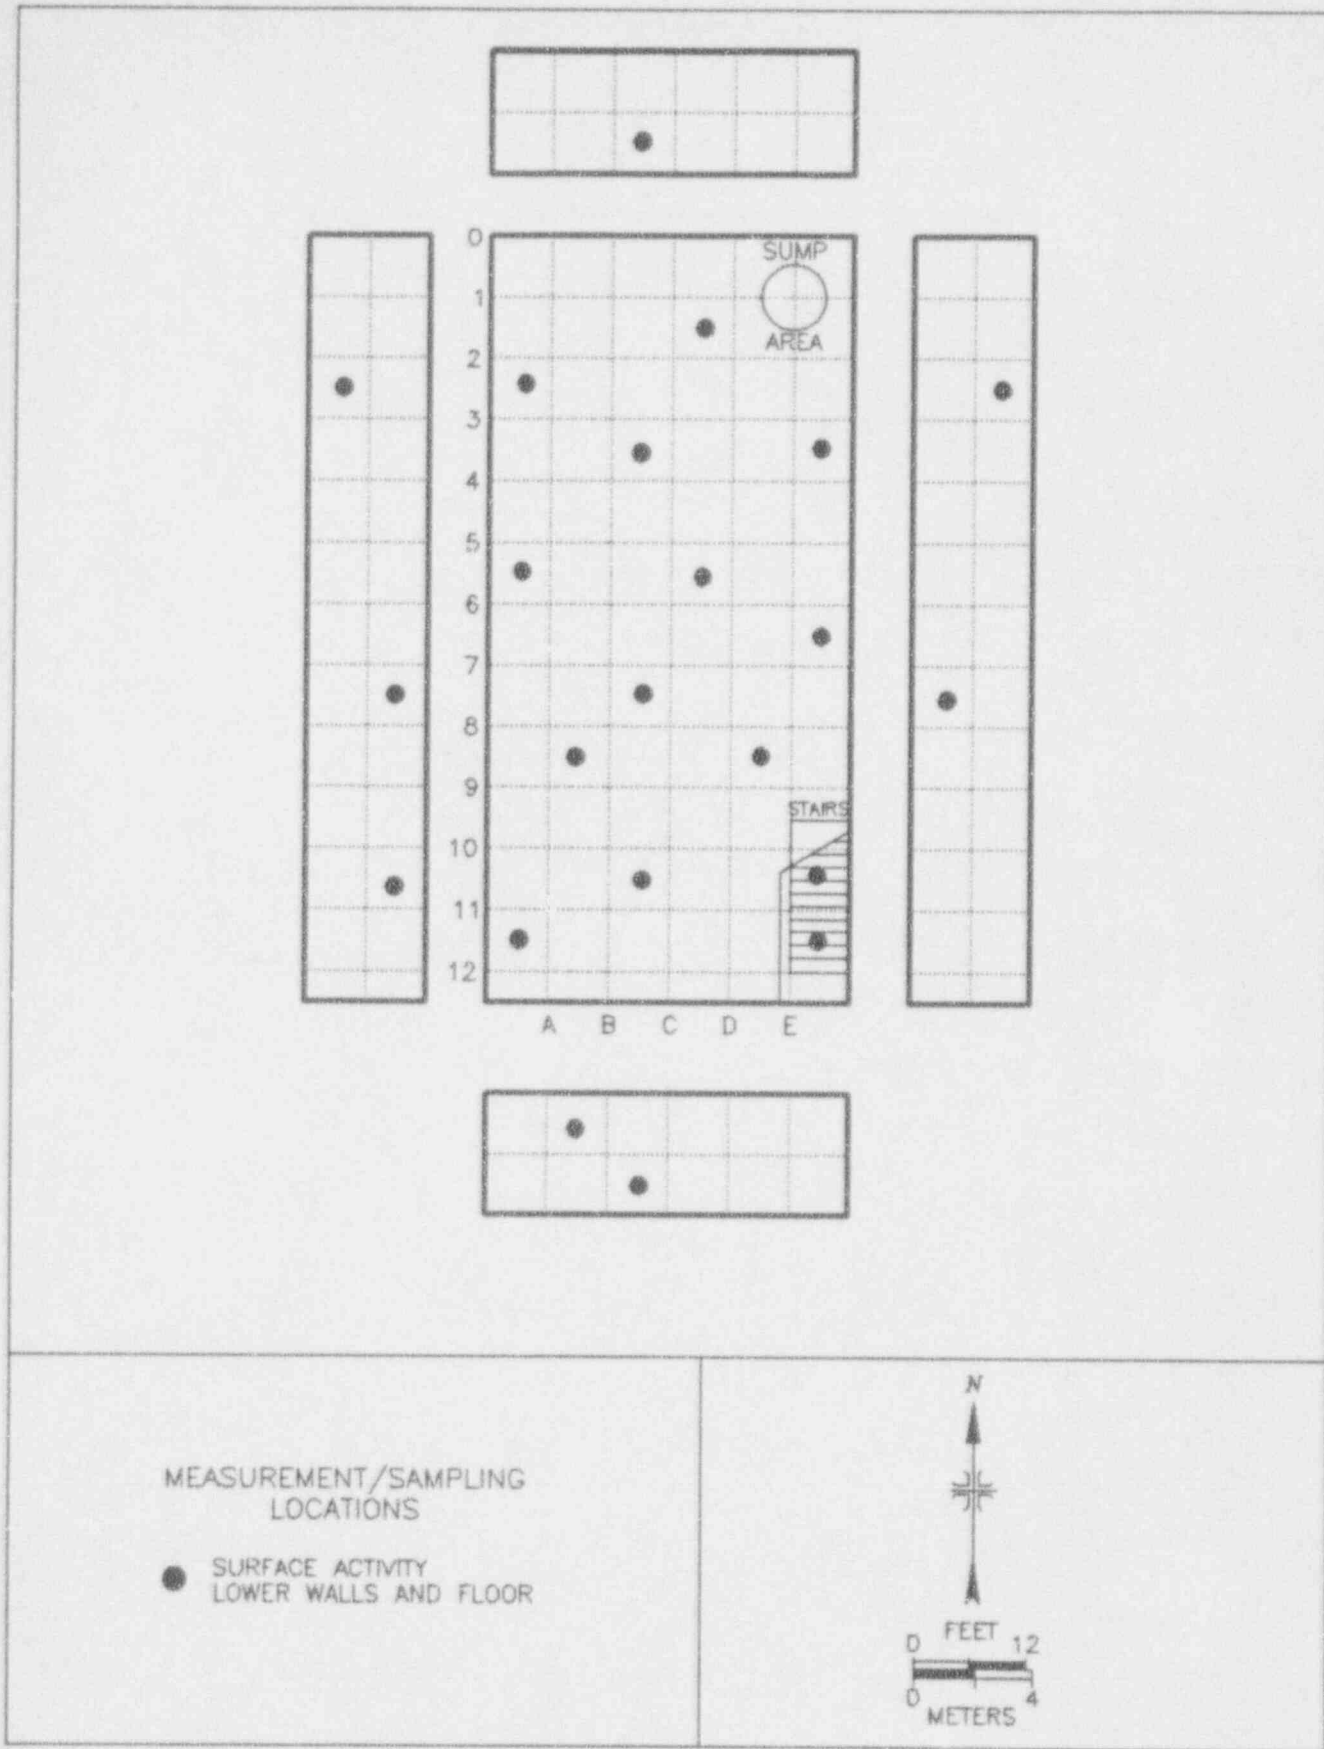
Building 9, Tank Pit – Measurement and Sampling Locations
